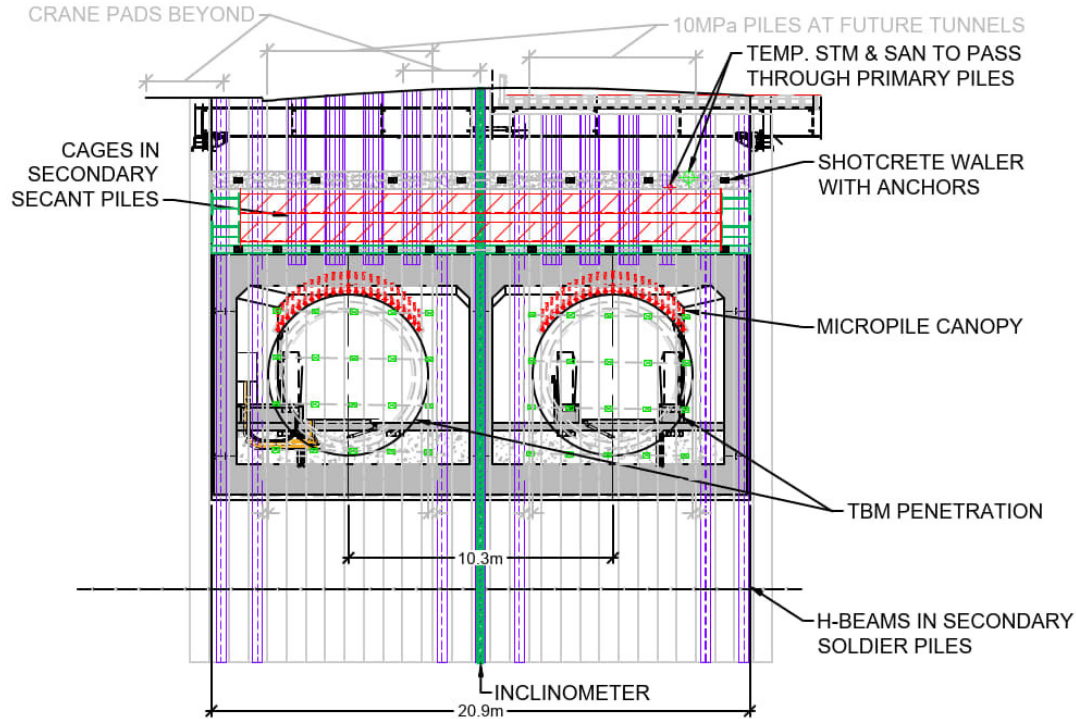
Conceptual shoring solution using walers and struts at Cypress Street opening in Zone 5
